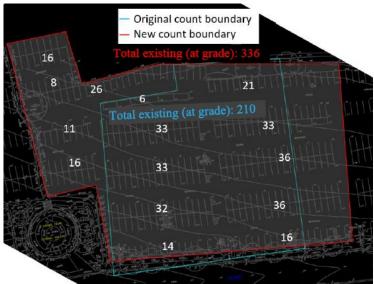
Total number of parking spaces at the existing Hospital Road on-grade car park Source: Arup
